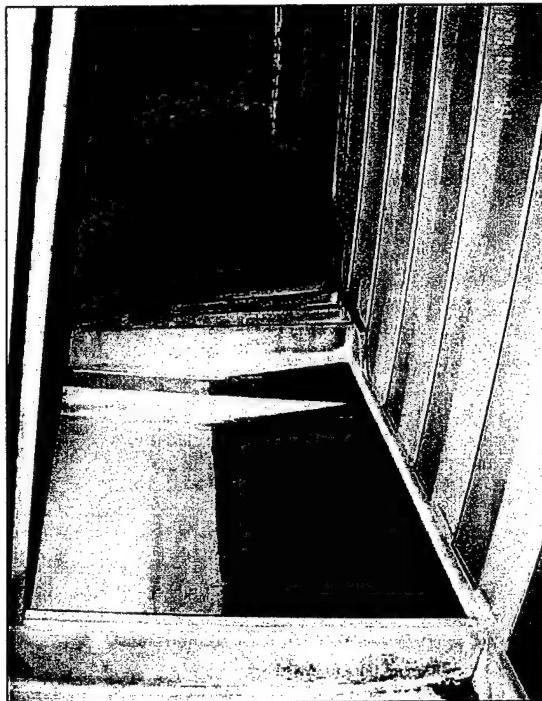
Standing water or debris lines between stiffeners at ends of bottom horizontal girder, typical.
